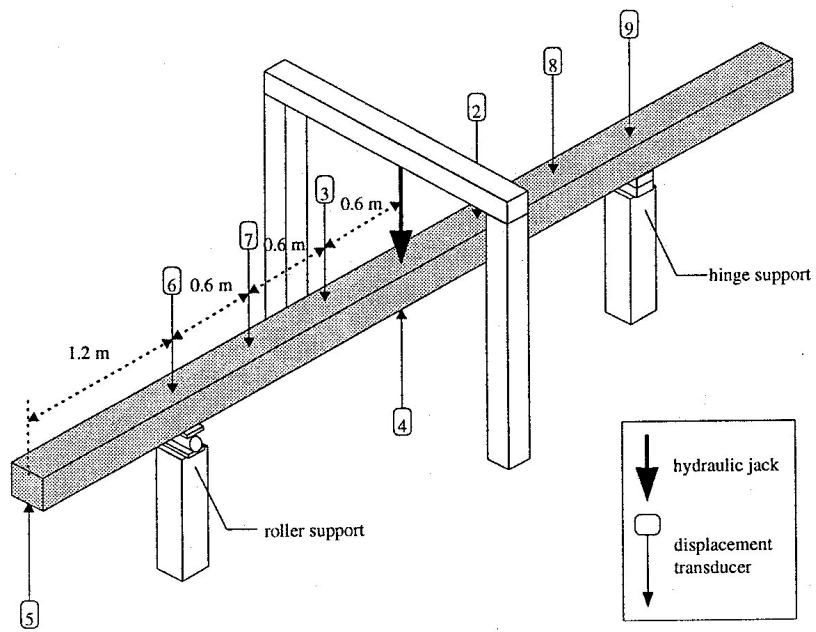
Static test configuration. Beams 1, 2, 3 and 5.
